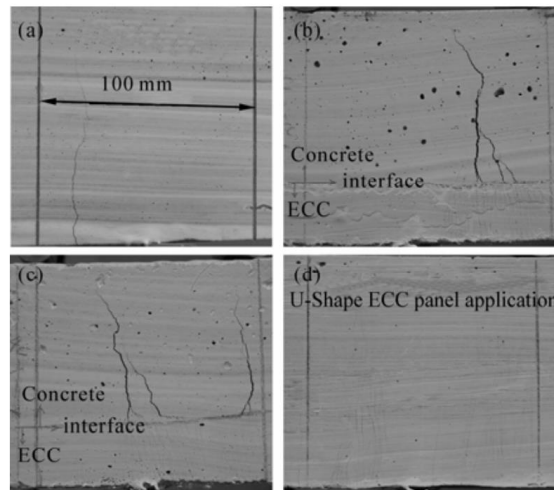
Cracking modes of SHCC-concrete composite beams [87].
